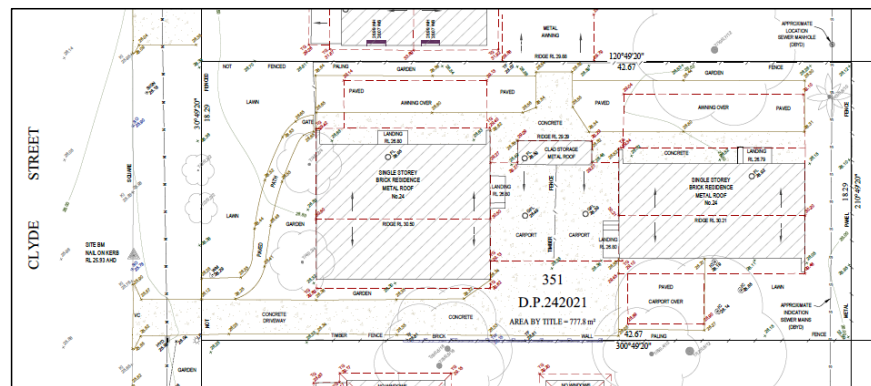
Extract from survey plan of the site (source: H&S Land Surveyors)
